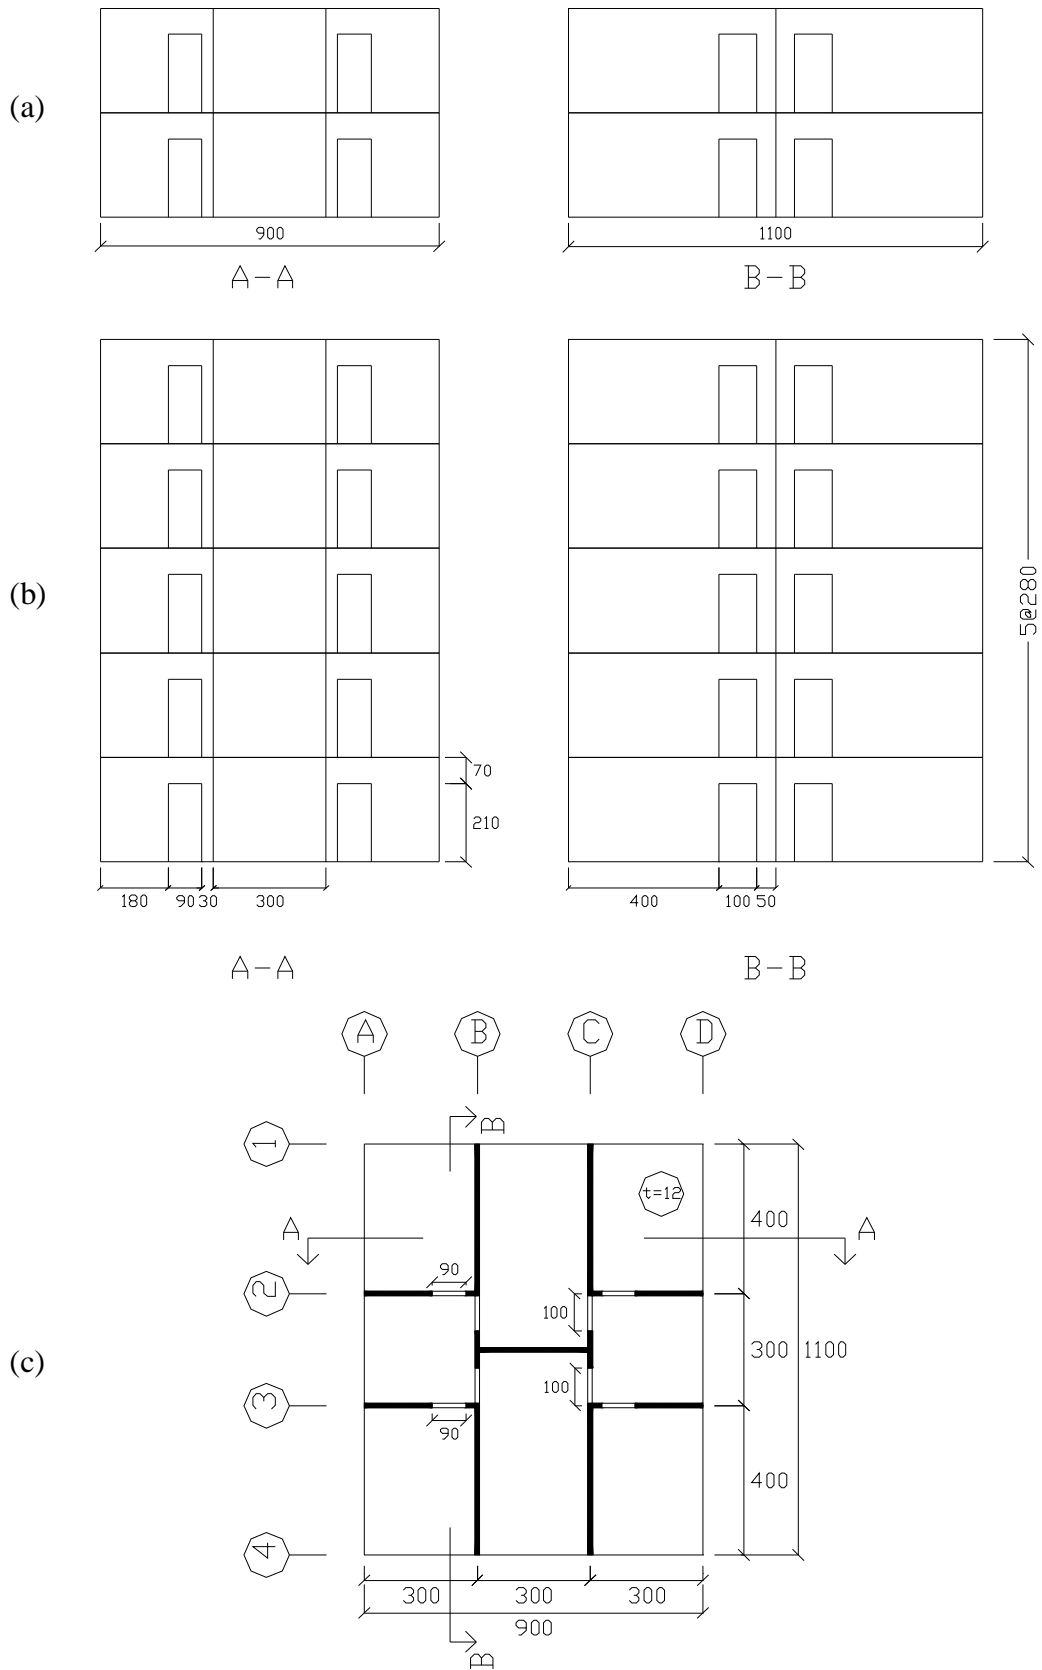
Typical plan and elevations for 2- and 5-story buildings – Plan No. 11 (units in cm). (a) 2-story elevation; (b) 5-story elevation; (c) plan view
